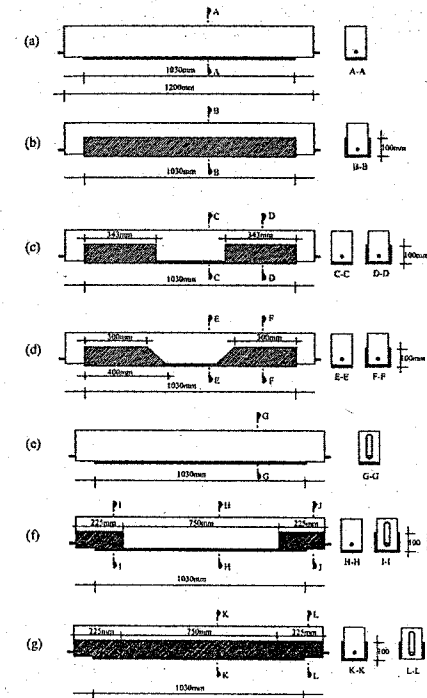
Configurations of retrofitting. Beams retrofitted with: (a) one strip on the tension face, (b) one strip on the tension face and two strips on the sides, (c) one strip on the tension face and four rectangular strips on the sides, (d) one strip on the tension face and four trapezoidal strips on the sides, (e) one strip on the tension face, (f) one strip on the tension face and four short strips on the sides covering the supports and the ends of the tension strip, and (g) one strip on the tension face and four short and two continuous strips on the sides, fully covering the supports and the tension strip sides.
